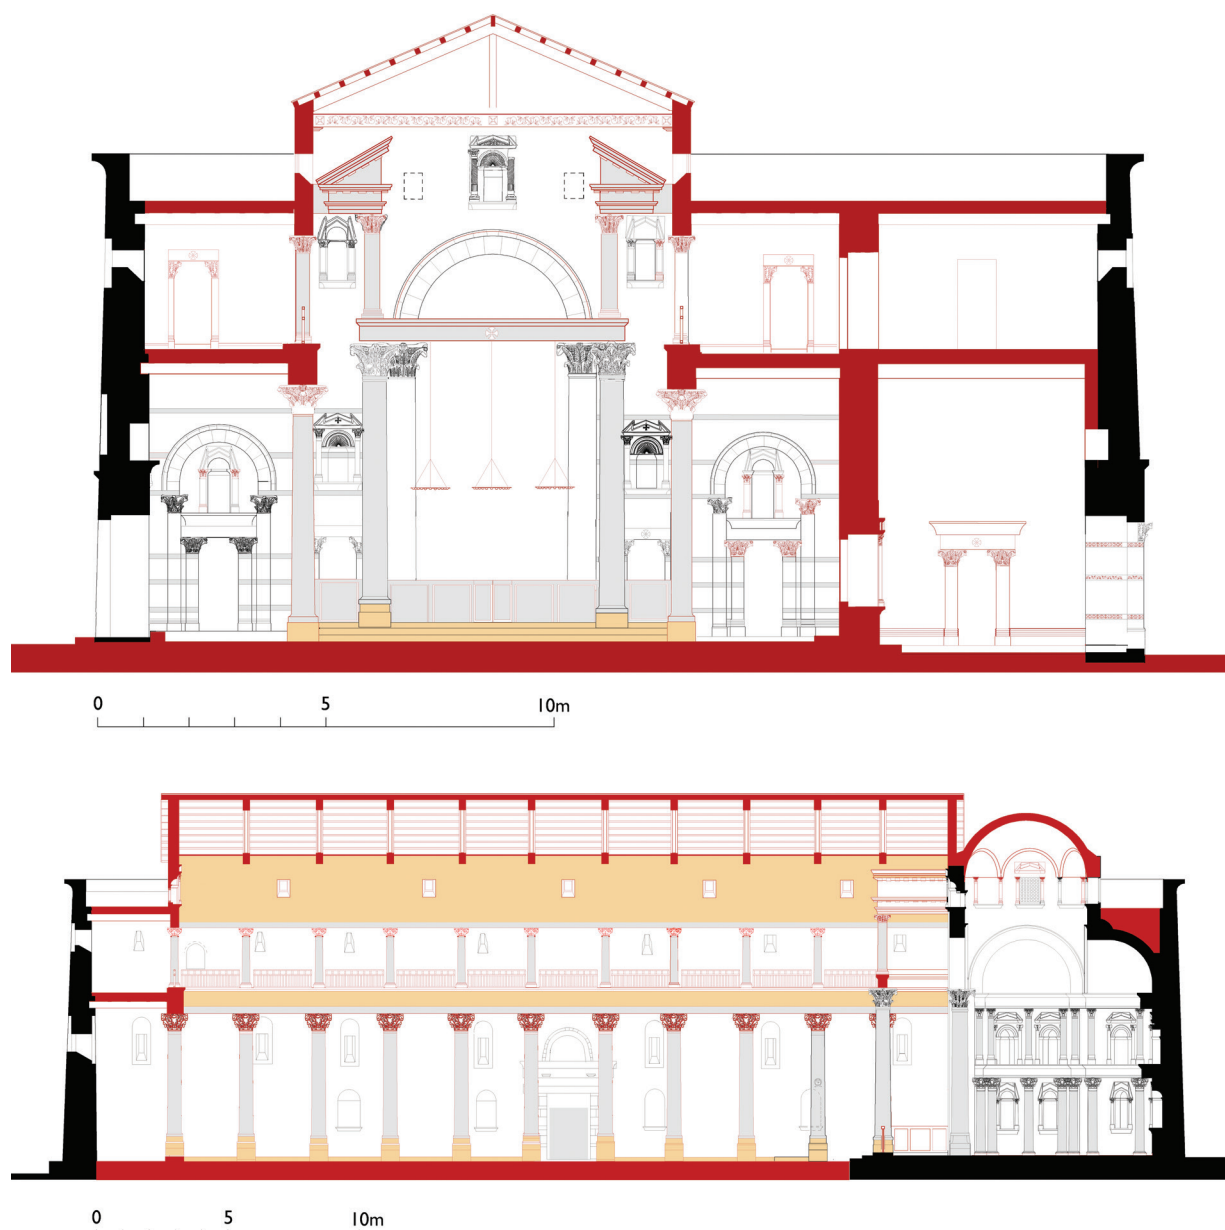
Reconstructed sections through the late antique church. Top: north-south section looking east through the nave and south hall; bottom: east-west section looking north through the nave showing gallery arcades with columns, clerestory windows and dome over triconch (drawing: author, 2014).
